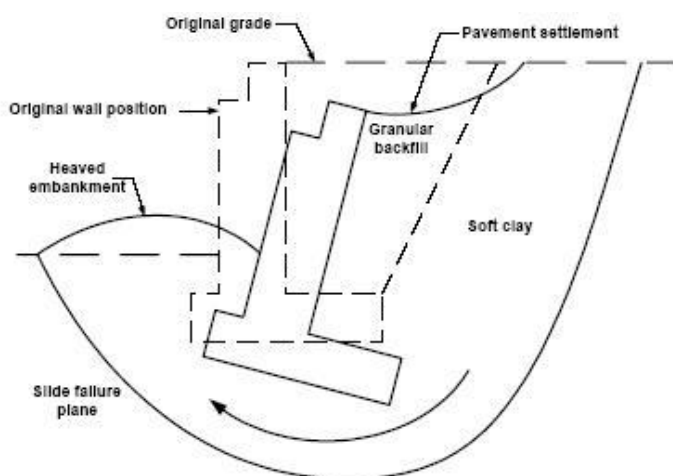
Lateral Movement of an Abutment due to Slope Failure
